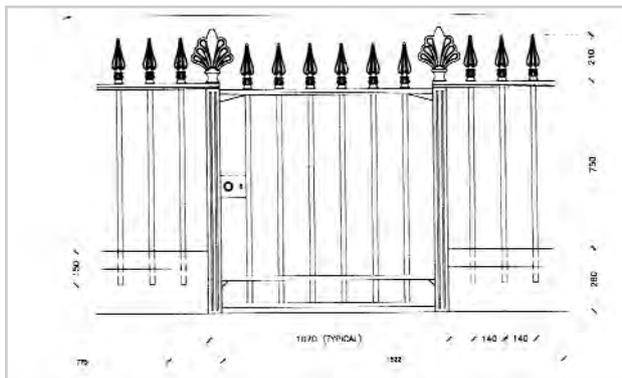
Detail of the above approved application showing gate and railing reinstatement. Image © Johnson and Wright Architects Ltd
